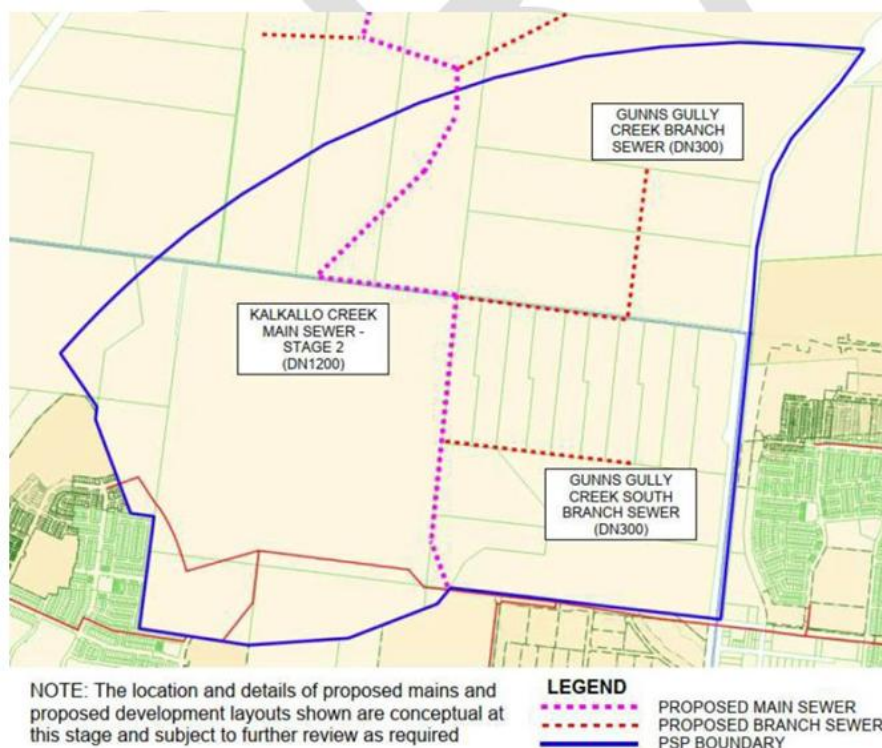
Yarra Valley Water Sewer Concept Plan (Source: Utility Servicing Assessment 2026, SMEC)
